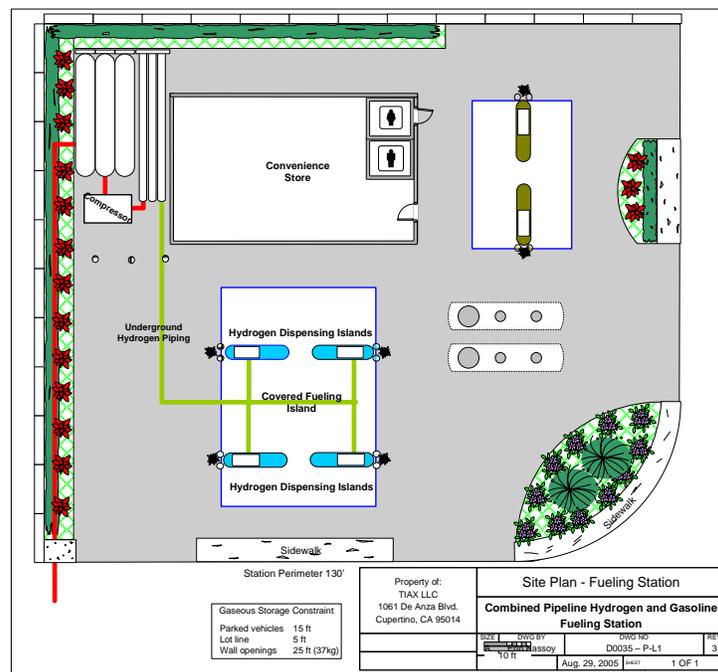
Pipeline Supplied Fueling Station Site Plan
